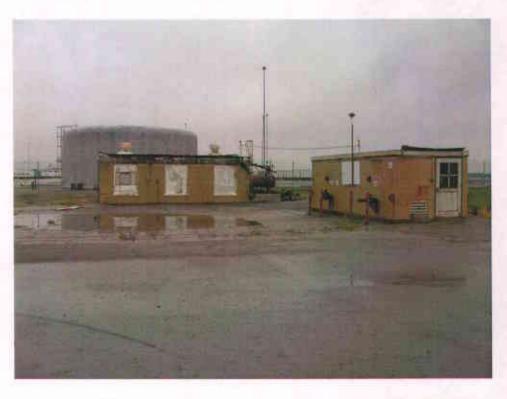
AL005/ FRA-8380-12, Building 26 (Pump House and Storage Tank), looking west.
